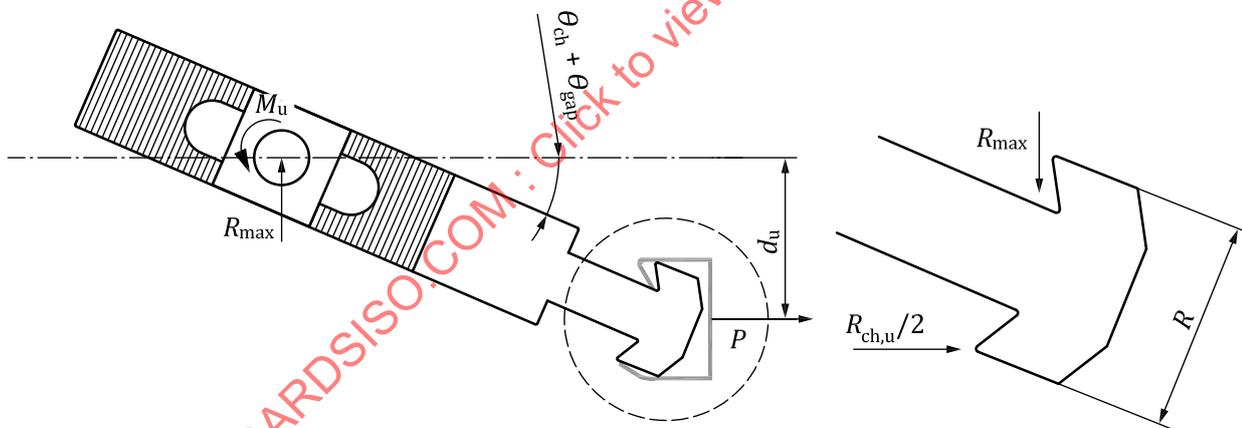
Failure mechanism of hammerhead strap connections with weak channels
